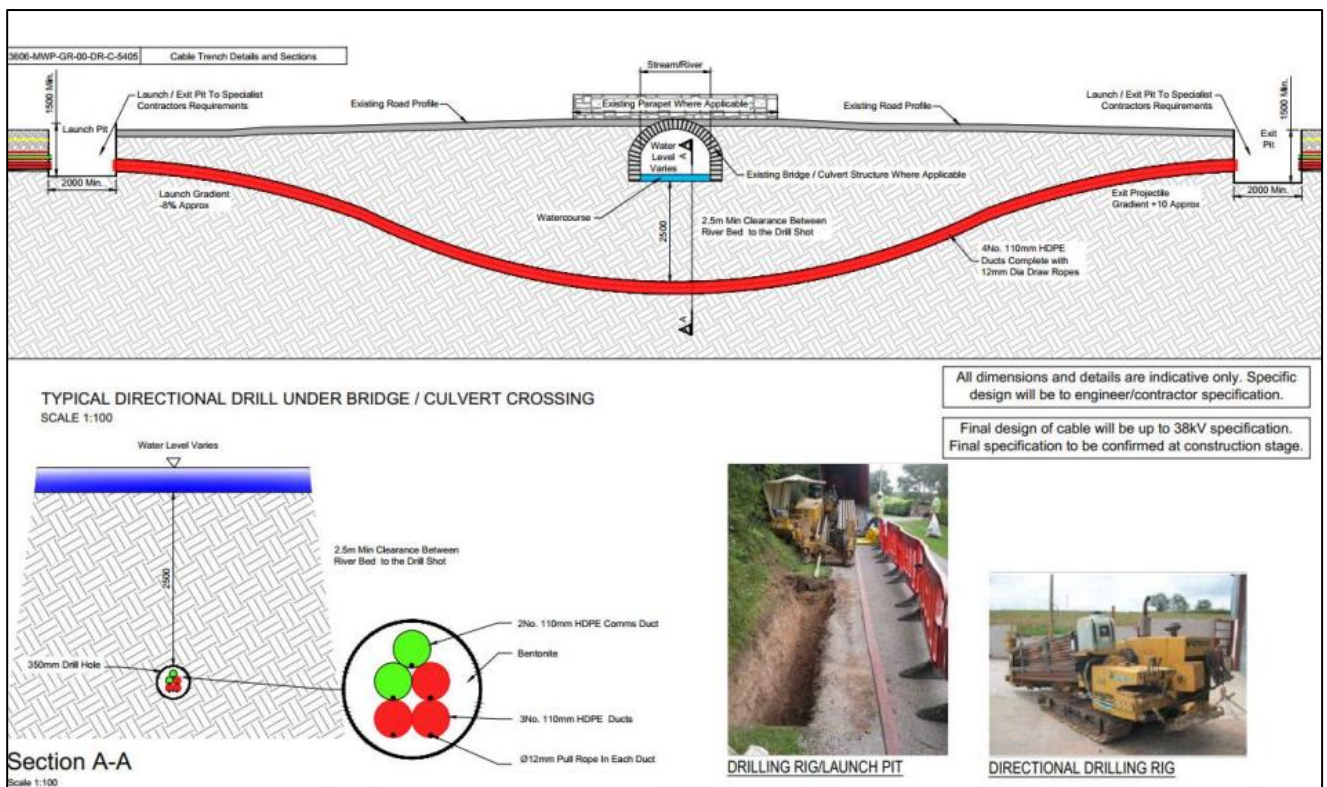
Summary of proposed directional drilling to facilitate installation of new grid route under bridge crossing
